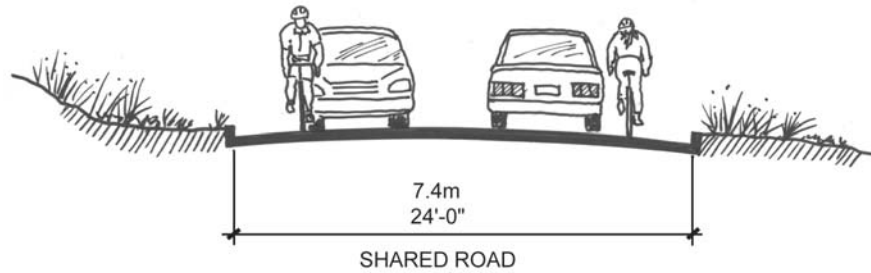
Existing Condition of Juan Bautista de Anza Trail at Battery Caulfield Road
